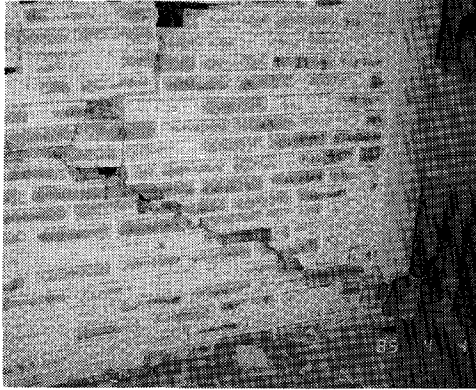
Fracture of a Brick Wall with a Frame (Chile Earthquake 1985).
